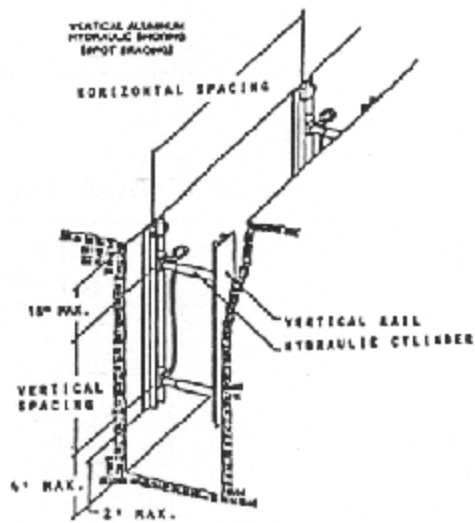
Vertical aluminum hydraulic shoring (spot bracing)
